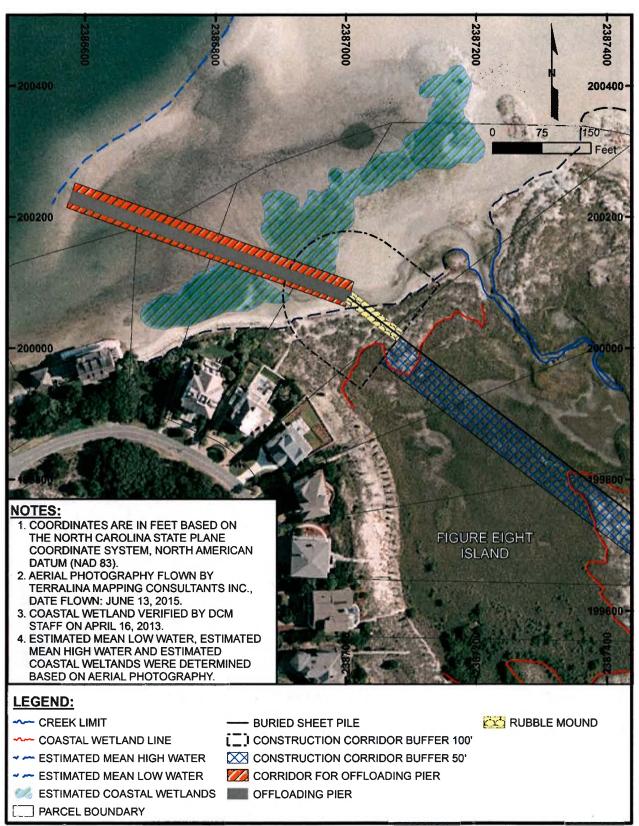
Proposed offloading pier, groin, and trestle to be constructed along the Nixon Channel shoreline.
